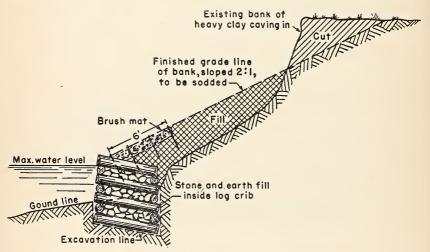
Stone-filled log crib used for toe-of-slope protection.
